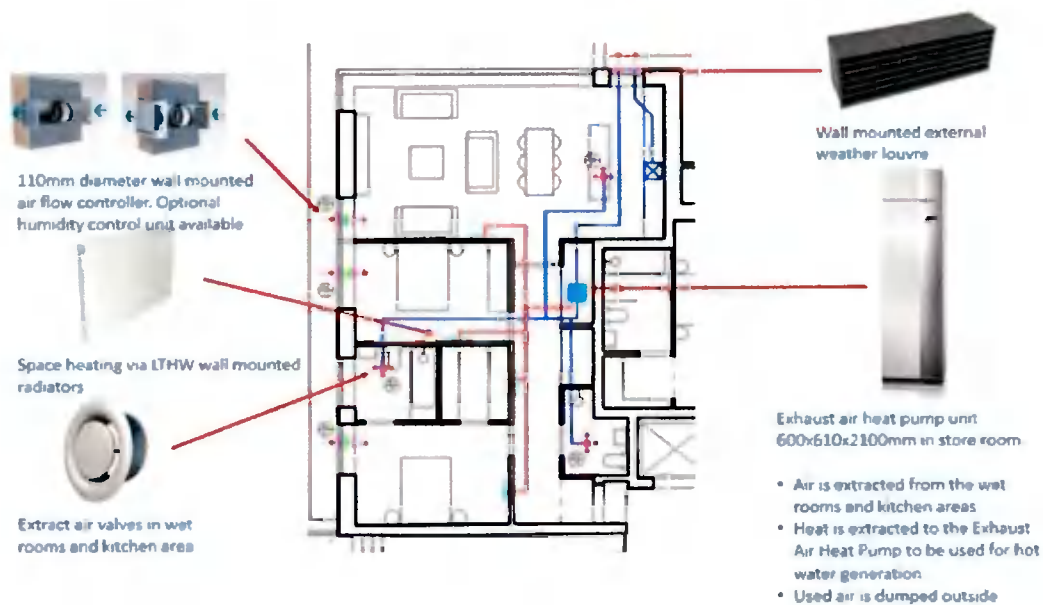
Example Diagram of Typical Exhaust Air Heat Pump Layout
